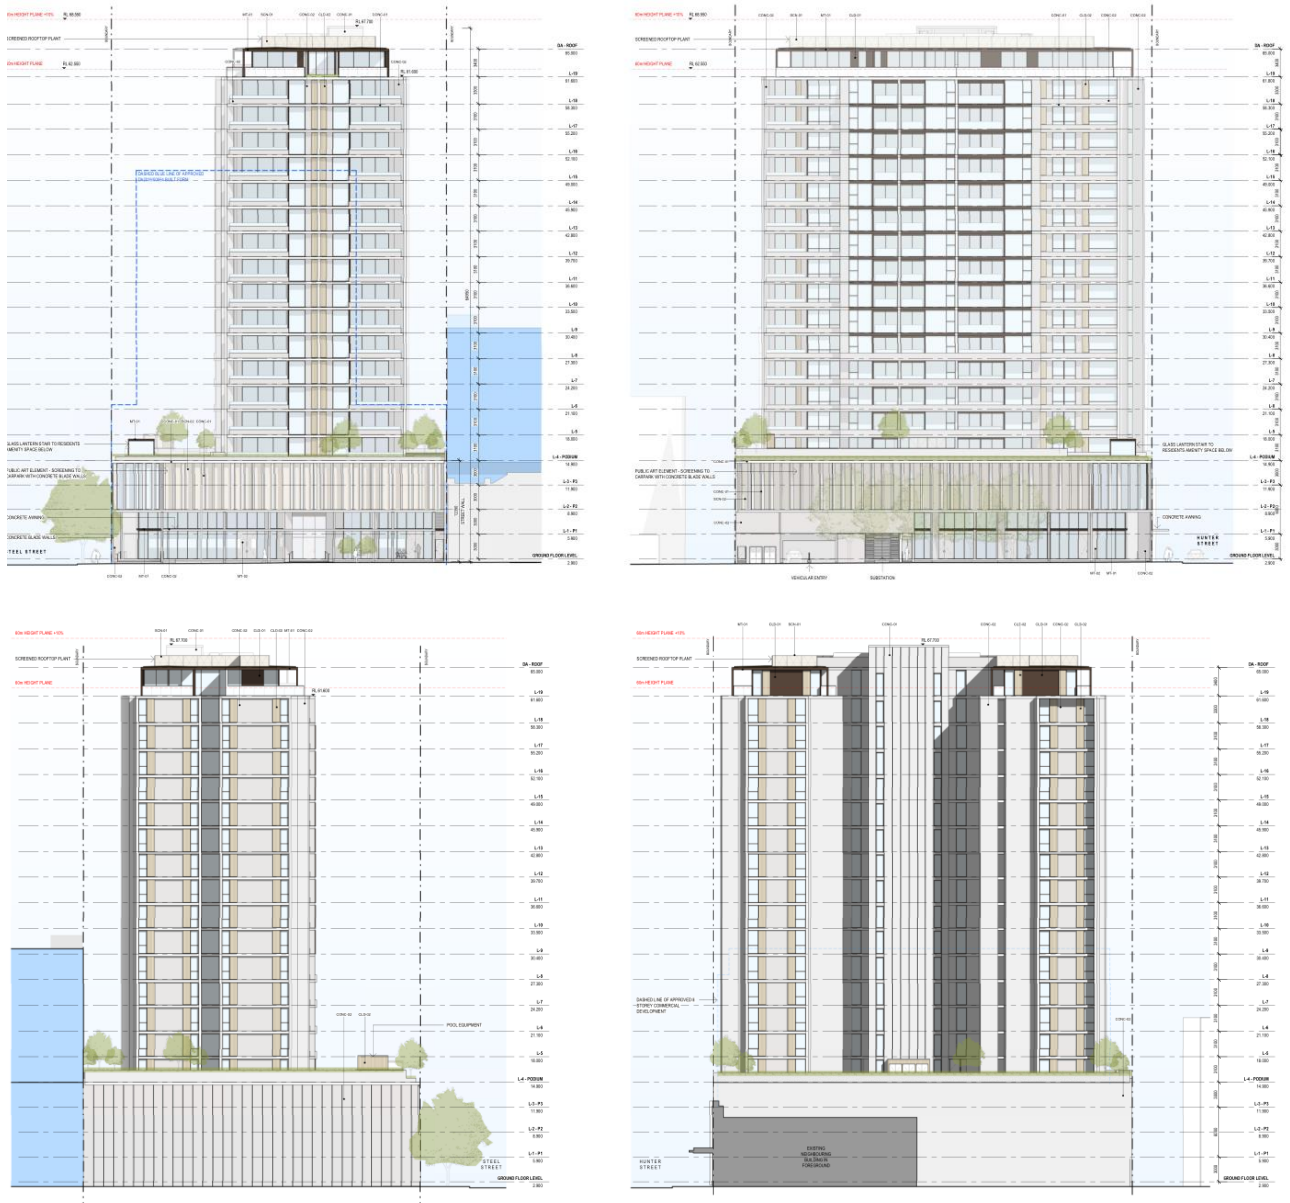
North elevation (top left), east elevation (top right), south elevation (bottom left) and west elevation (bottom right) of the proposed development (Stewart Architecture, 2022)
